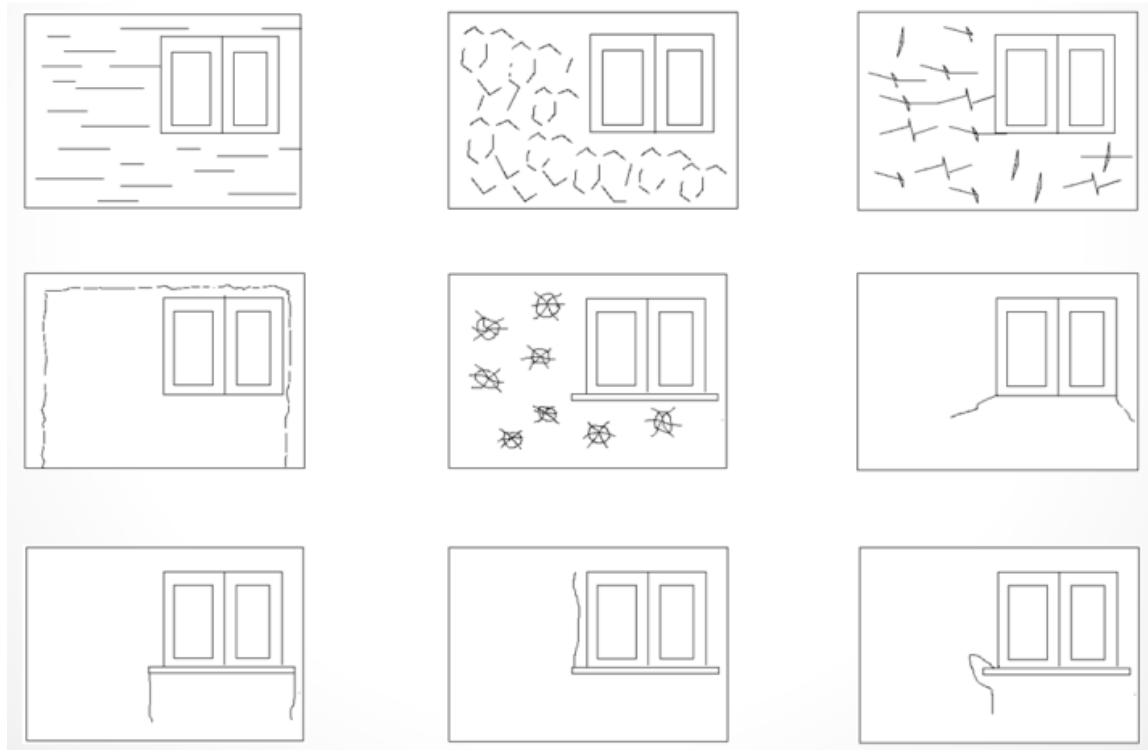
Typical location of cracks and their patterns in masonry walls (Pereira and Pereira 2015).
